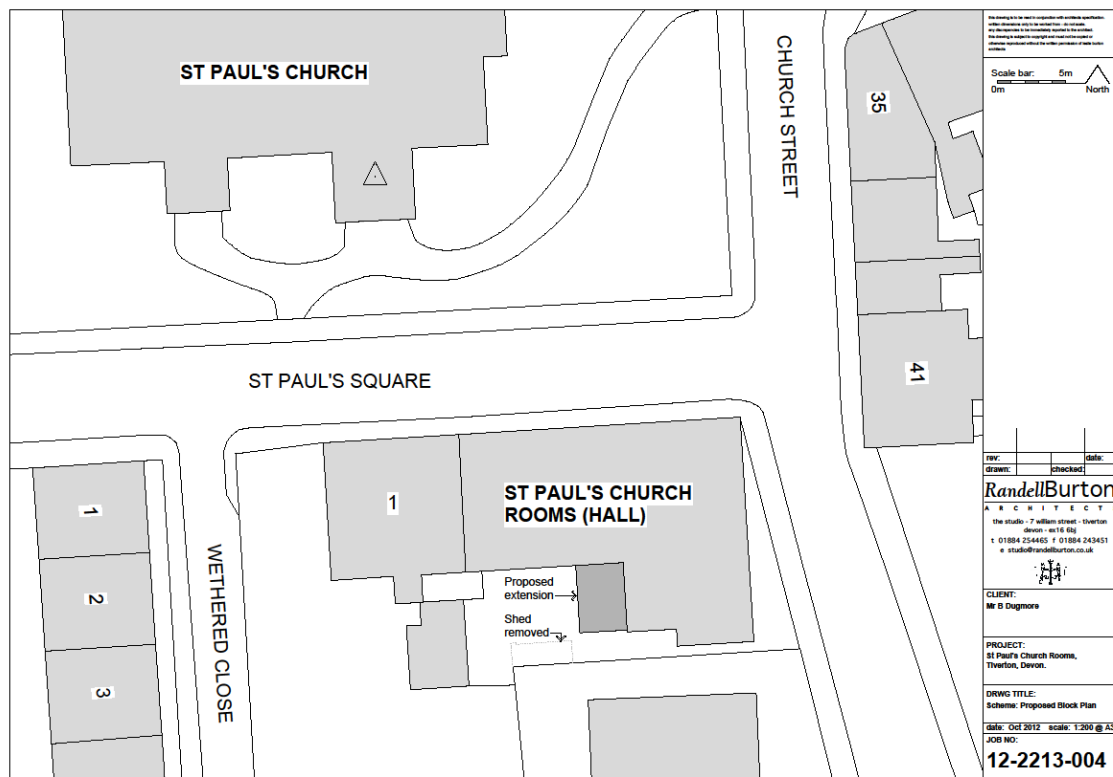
St Paul's Church Rooms, Tiverton: site block plan
